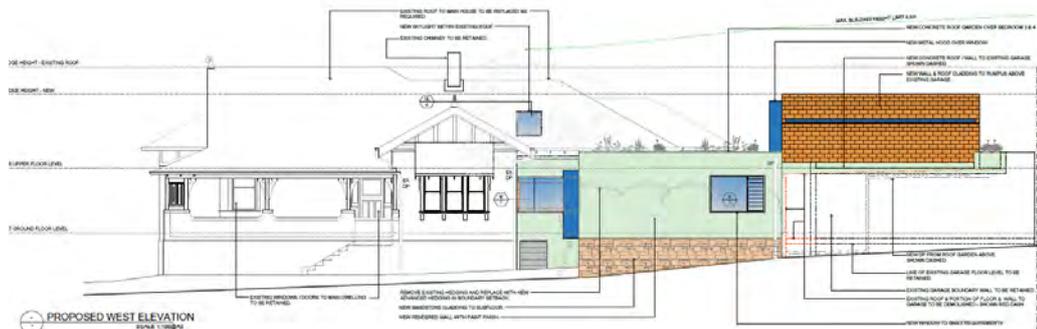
Proposed west elevation. (Source: Castlepeake Architecture)
